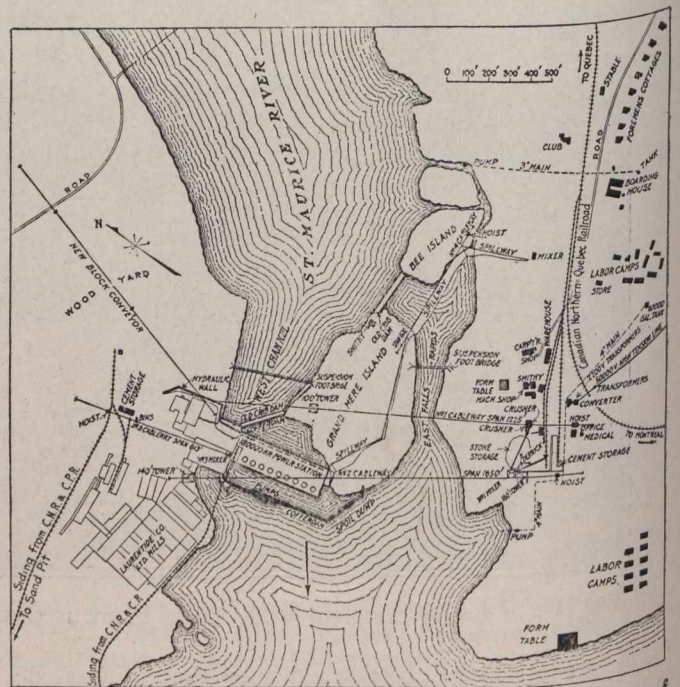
Contractor's Construction Camp, and Layout of Present and Proposed Development at Grand Mere.\
